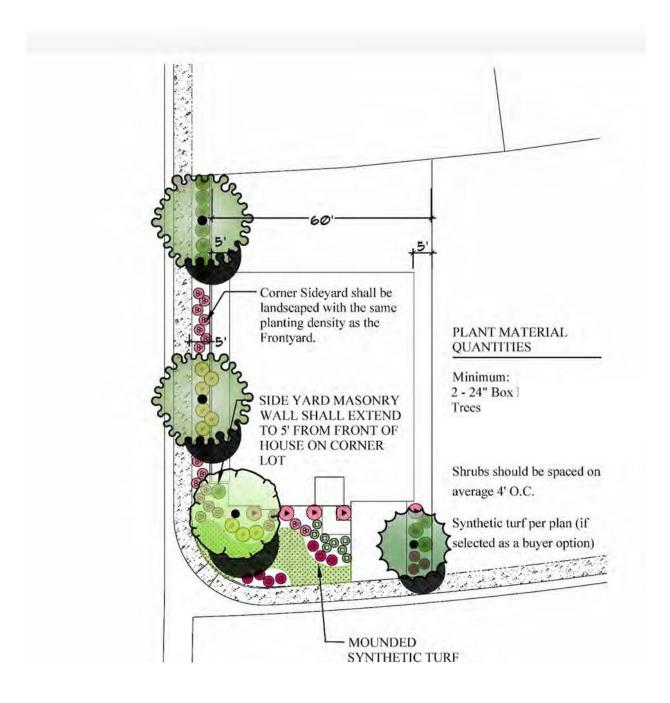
TYPICAL CORNER LOT, 60' LOT
